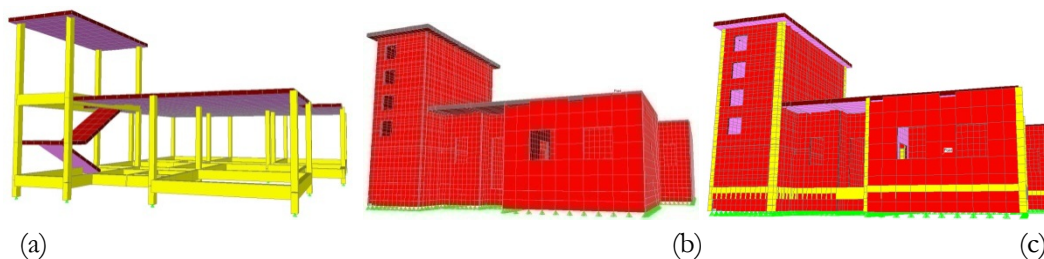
(a) Concrete rigid frame model, (b) Masonry wall bearing model, (c) Mixed model
